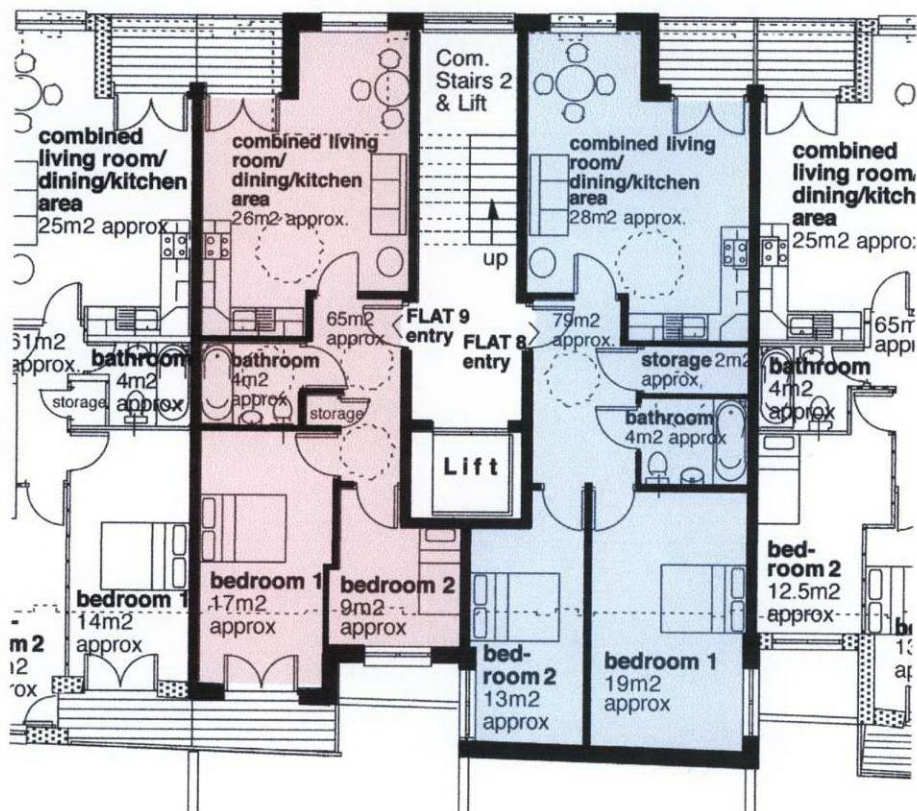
Second Floor Plan Showing Flats 8 & 9.
